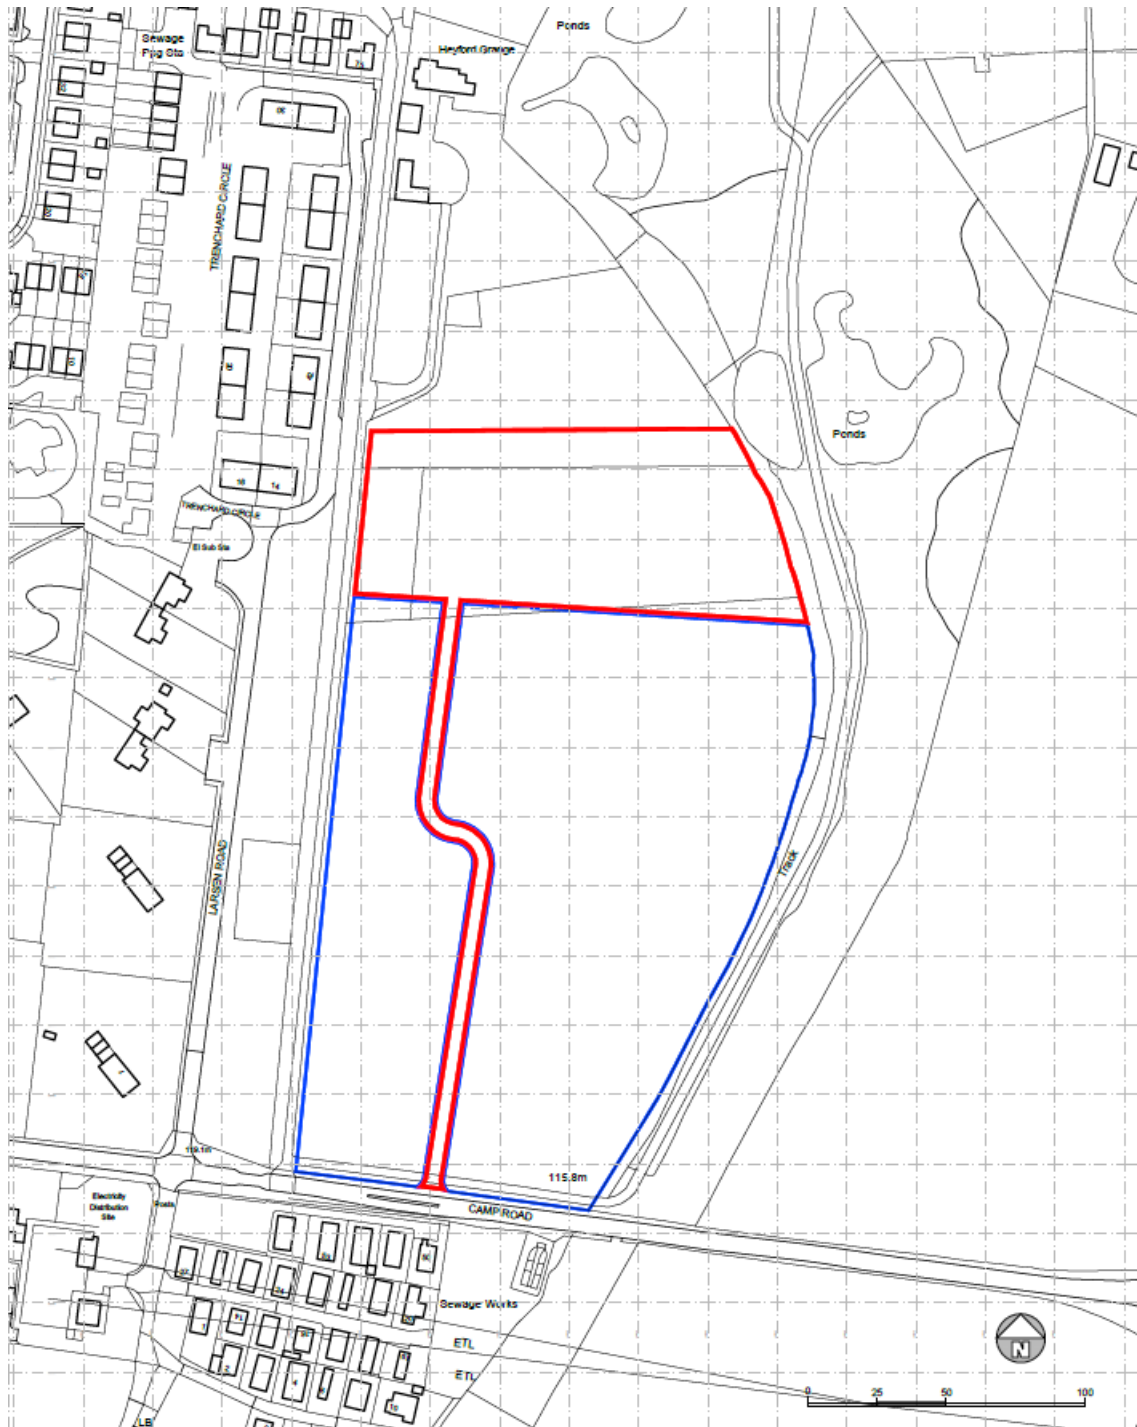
Application Ref. 21/03523/OUT – Site Location Plan
